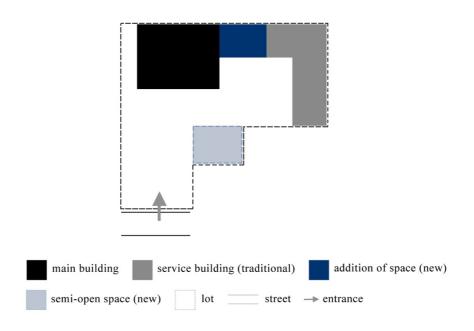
Case #7 House - Organization of the Buildings on the Lot
